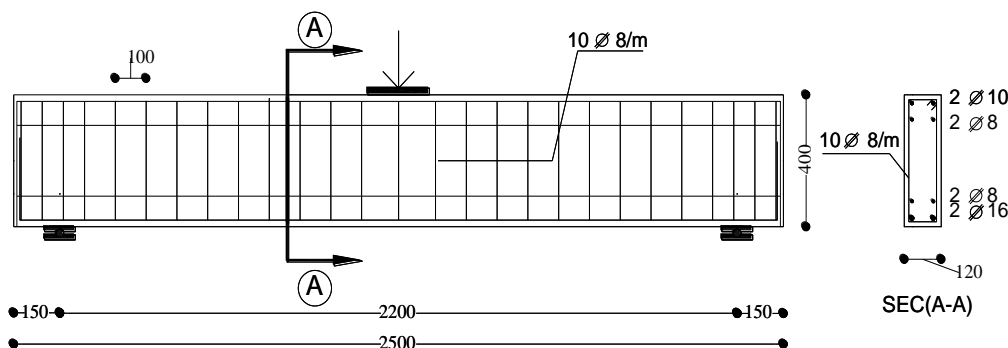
Dimensions and reinforcement details of solid beam with side reinforcement.
